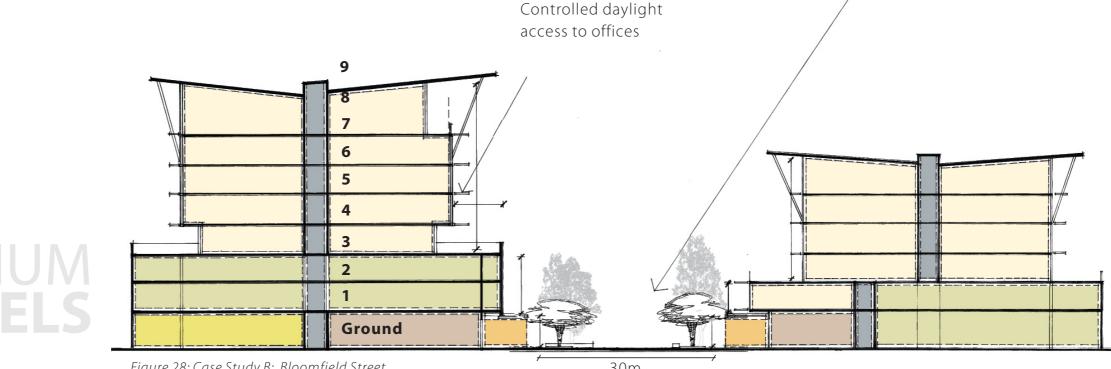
Bloomfield Street Ilustrative Street Edge Section (Detail)
